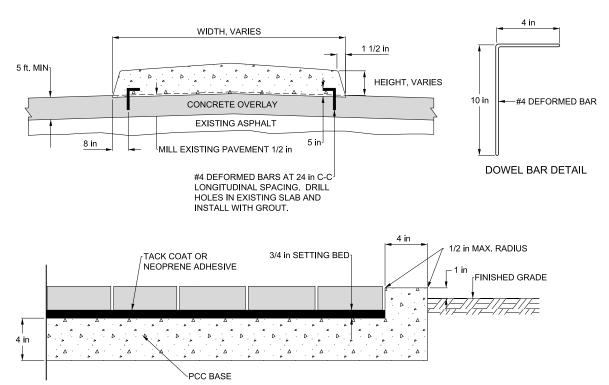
Doweled median (top); brick sidewalk with concrete base (bottom)
